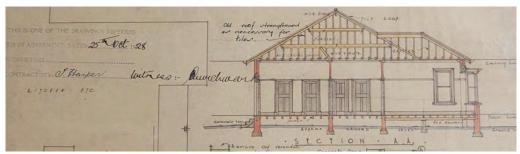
Section A-A included in plan for 'Alterations & Additions to Head Masters House, Barker College', prepared by Joseland & Gilling, architects, and signed by contractor J. Harper on 25 October 1928. (Source: Barker College Archives, Plan M0005).
